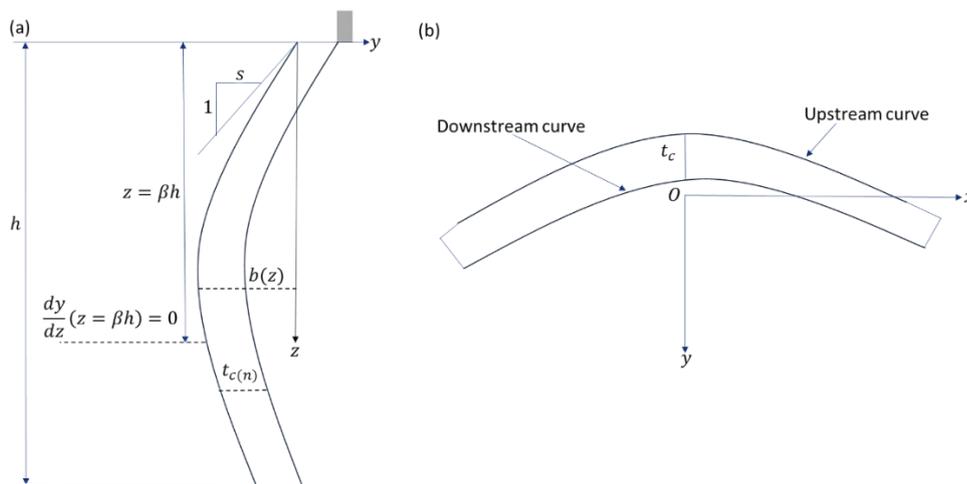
(a) Central vertical section of arch dam (b) A horizontal section of parabolic arch dam [7]
